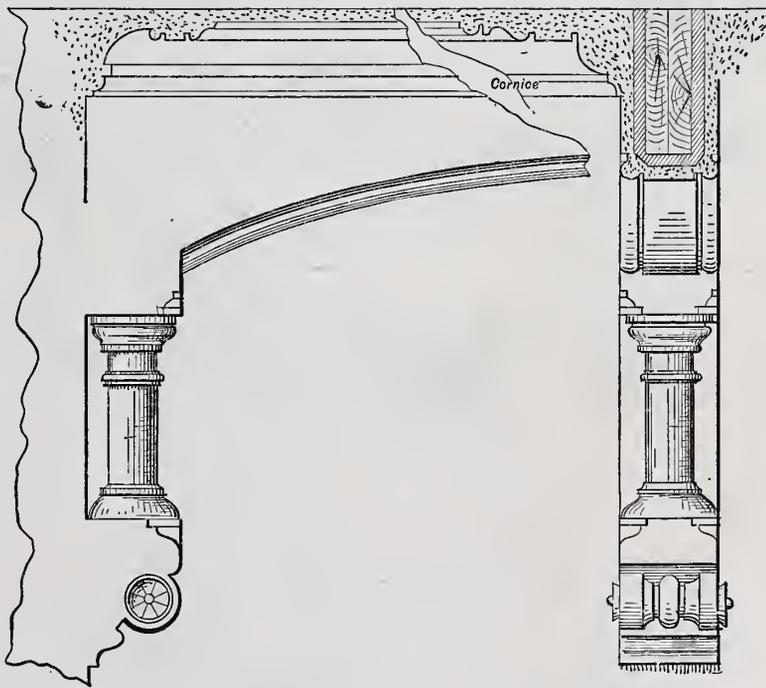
Arch Over Main Stairs.—Scale, 3/4 Inch to the Foot.
